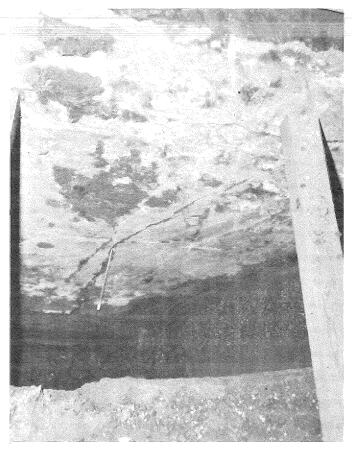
Break in north wall of drainage inspection chamber at Station 0+89 as exposed in Excavation No. 7B. Break closes to hairline crack at top.
